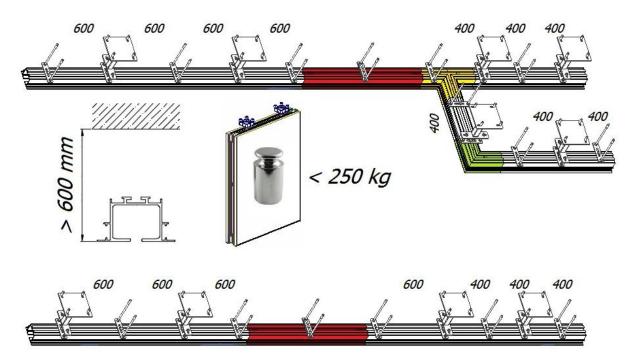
Location of track fasteners for panel weight below 250 kg and distance from track to ceiling greater than 600 mm
